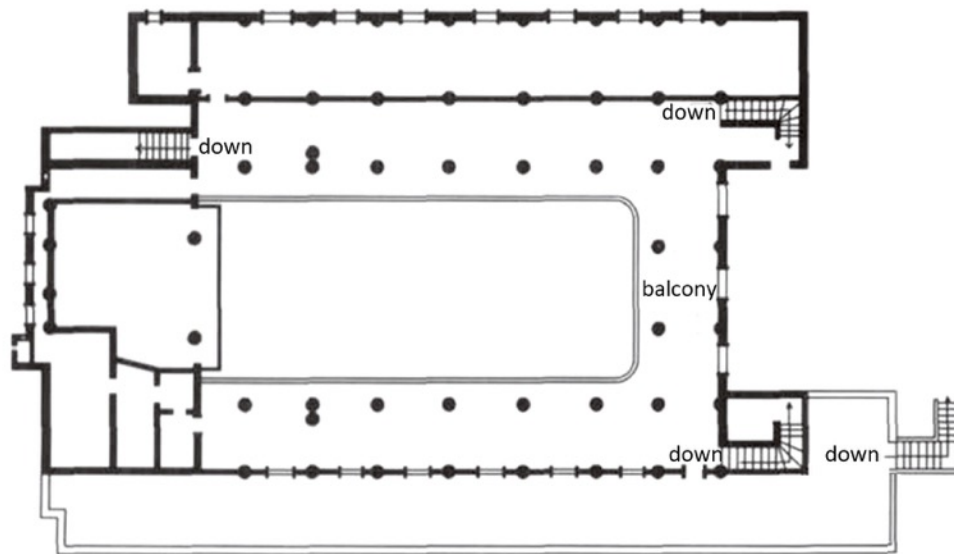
Schematic diagram of the floor plan of a typical playhouse in Dashilar
